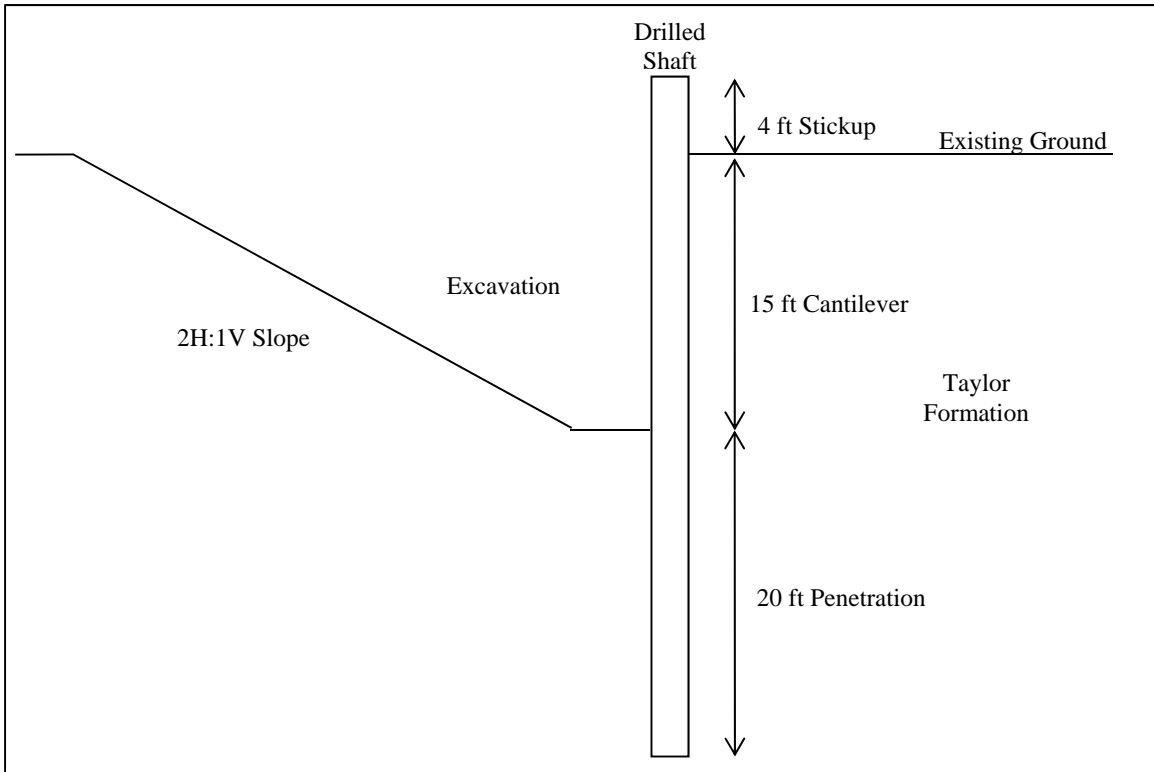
Cross section of wall and excavation at center shaft, facing east (not to scale).
